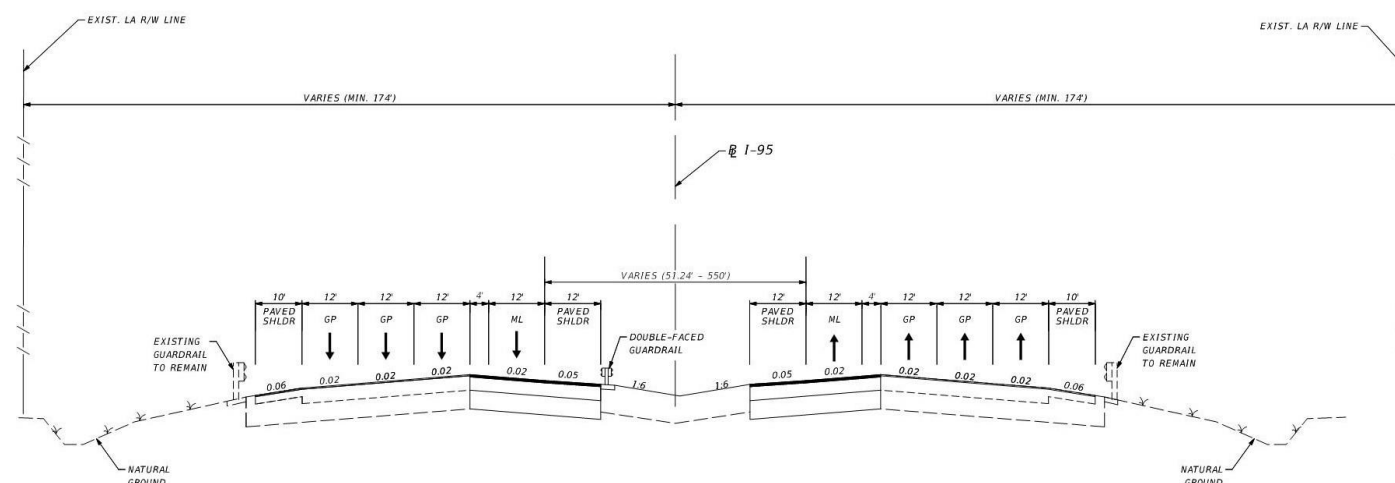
| Proposed Typical Section - SR 9 / I-95
